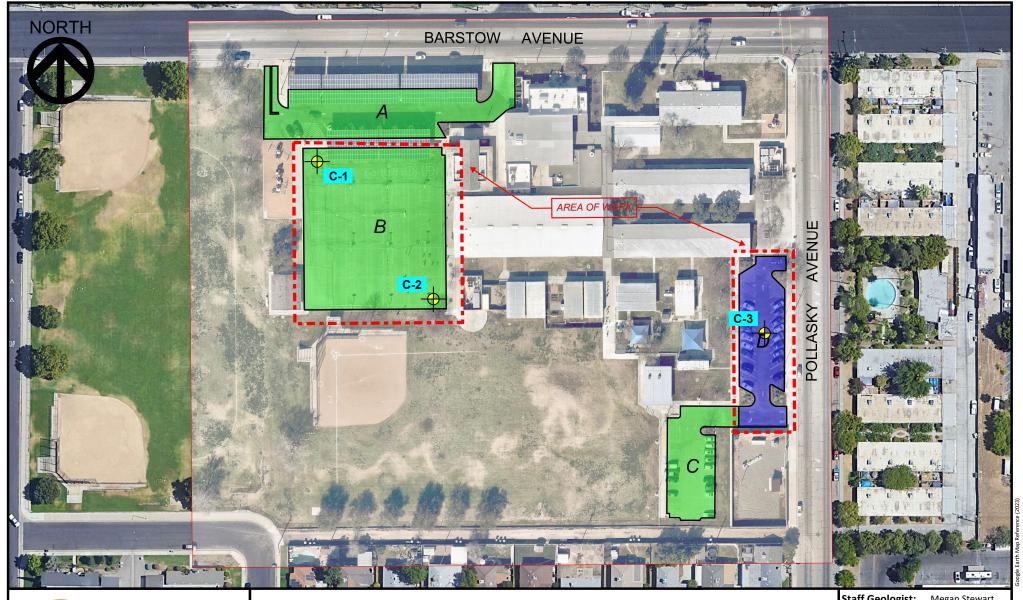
CORING LOCATION MAP SIERRA VISTA ELEMENTARY SCHOOL PAVEMENT MAINTENANCE
